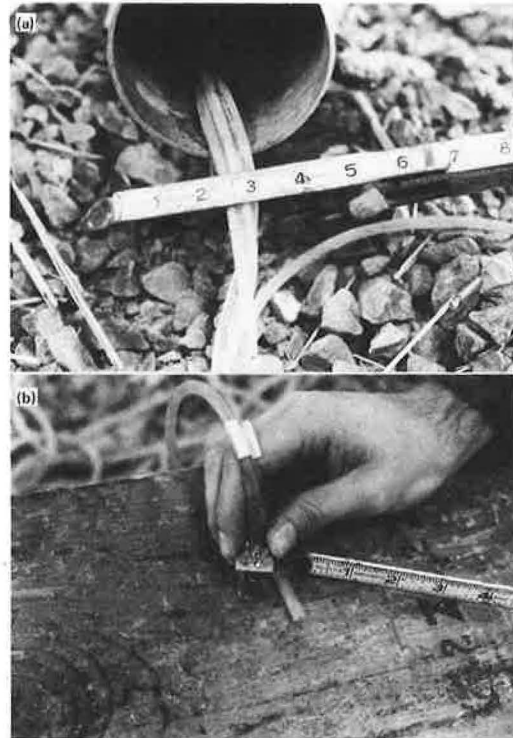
Connection of pressure transducers to openings using flexible tubing; (a) flexible tubing emerging from PVC pipe; (b) pressure transducer connected to sensor tubing.
